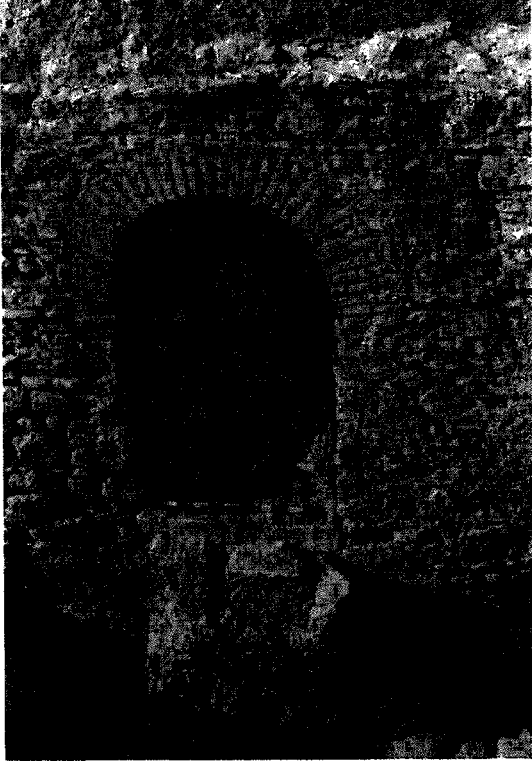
Sector MMS-N: arched opening in Roman east-west wall, after consolidation and reconstruction (looking south).
